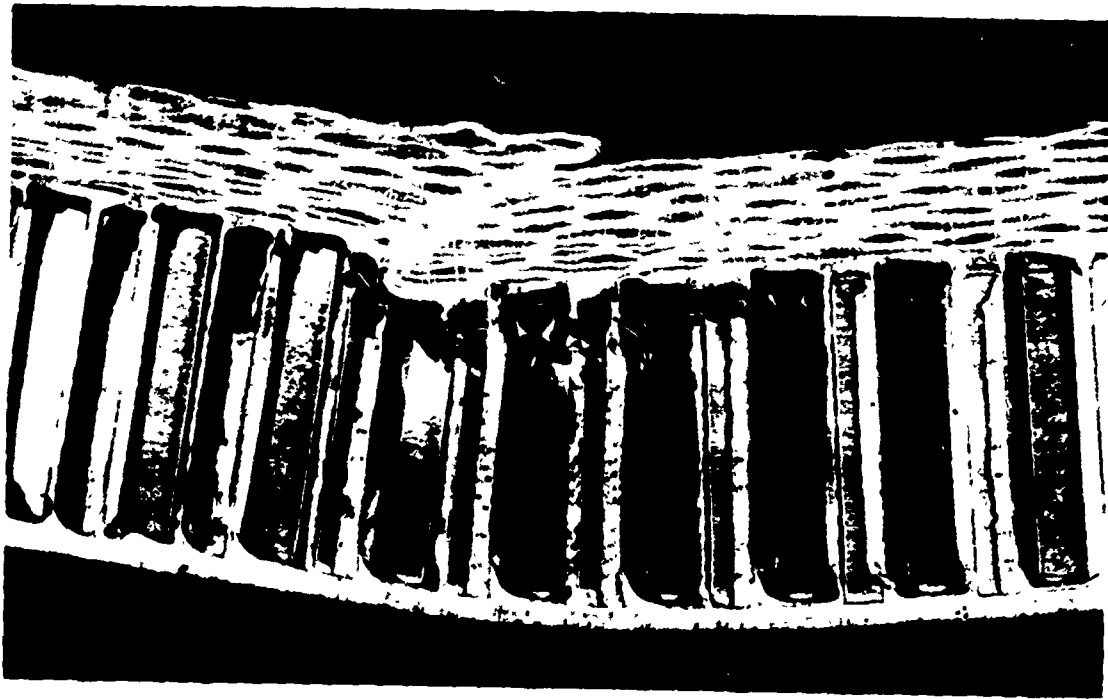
Failure of the GRP compression facing (beam specimen, Configuration 6).
